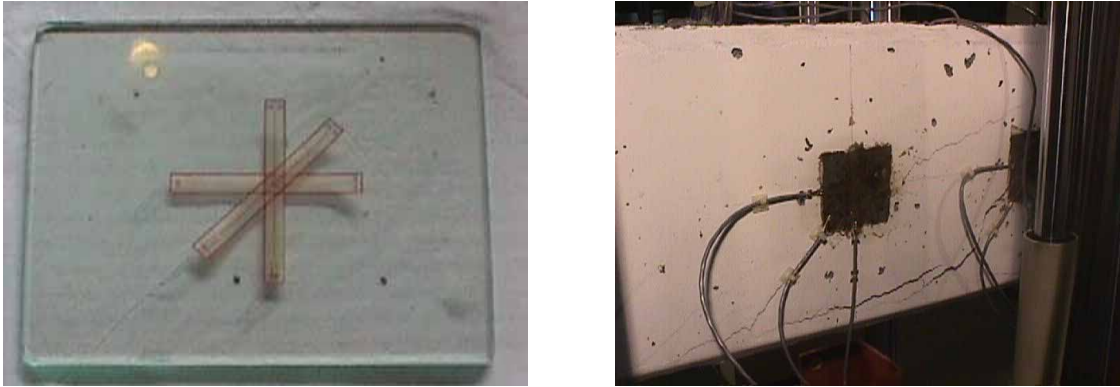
Strain gauge rosette in the concrete web for beam specimens H60 and H75
